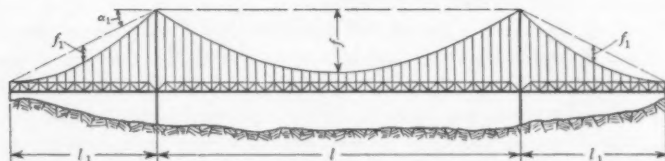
SUSPENSION BRIDGE WITH TWO-HINGED STIFFENING TRUSS AND SUSPENDED SIDE SPANS
